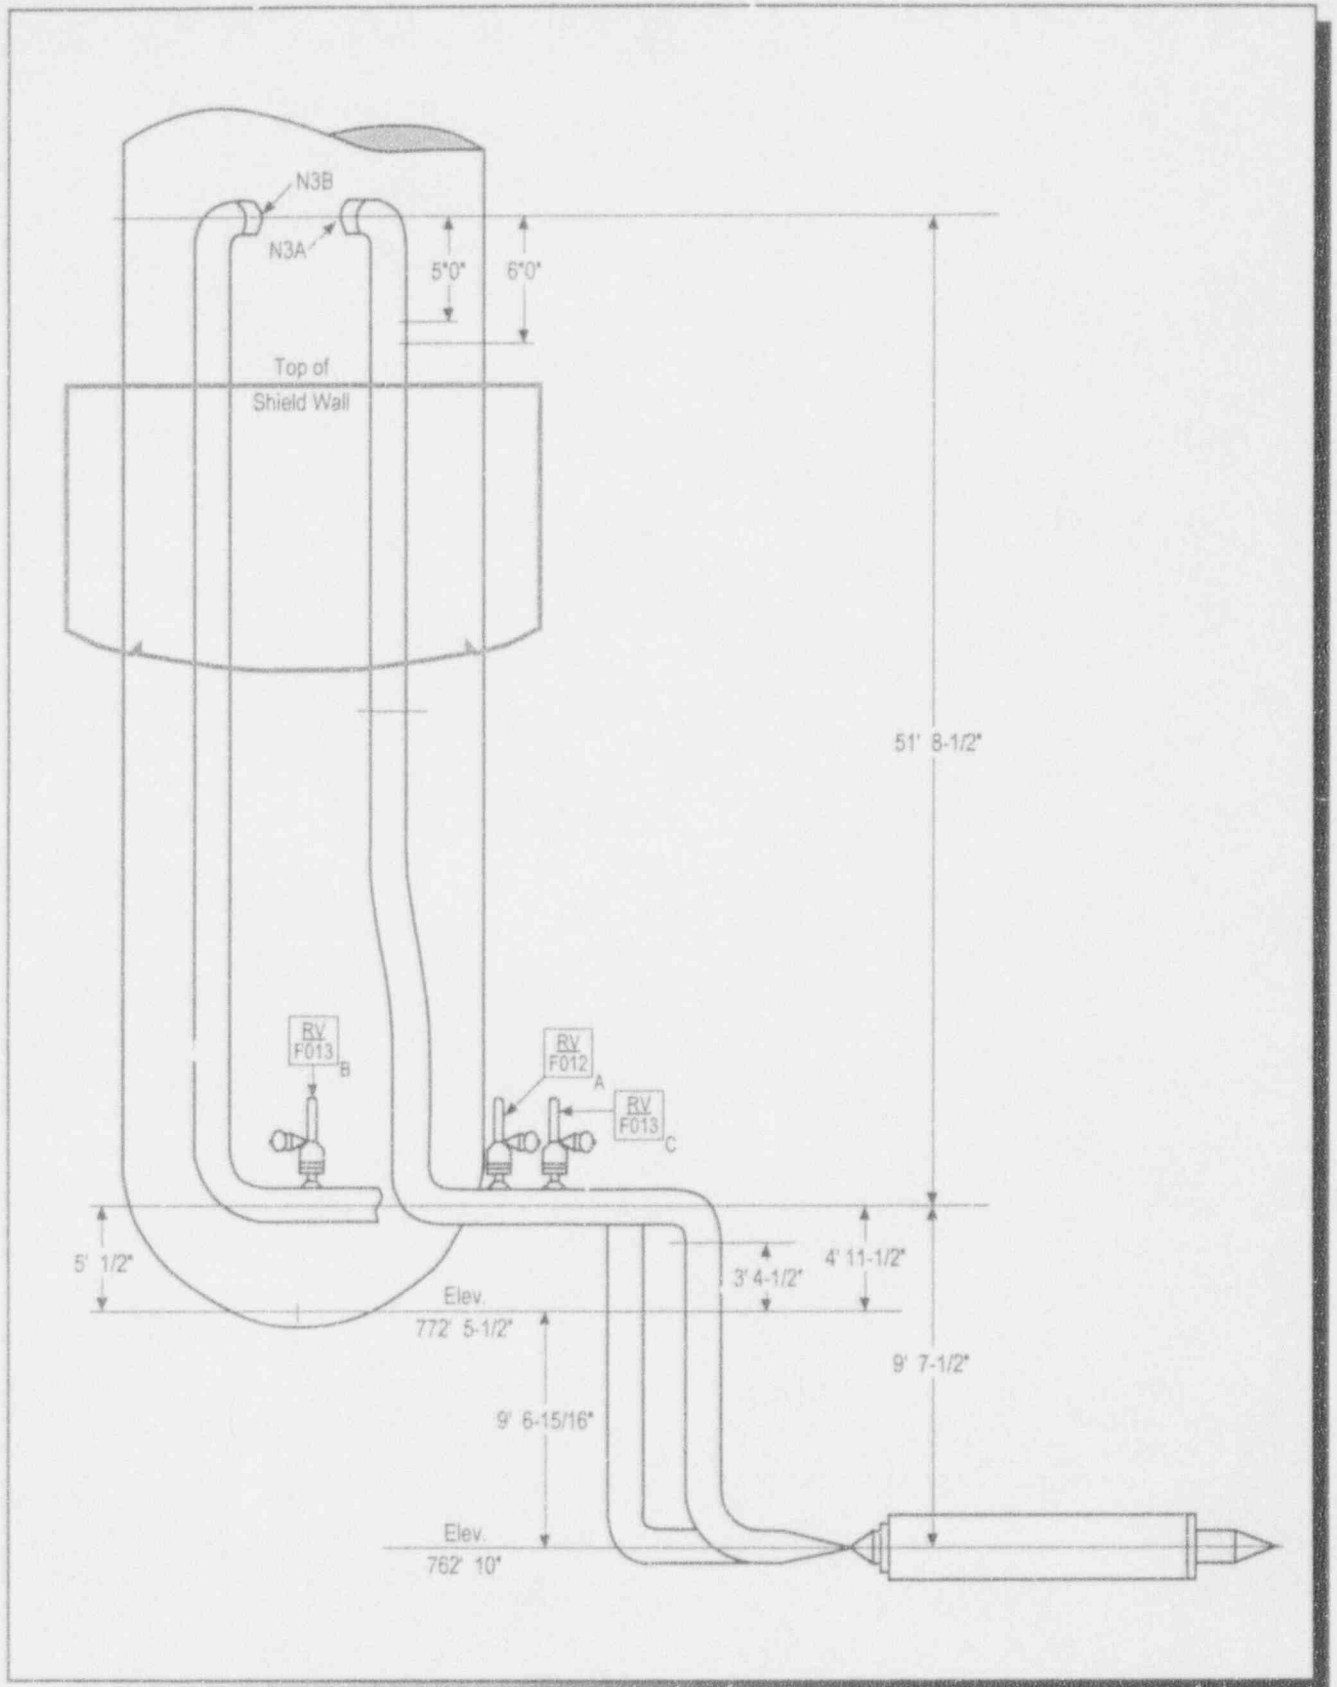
Vertical Cross-Section of Main Steam Line Arrangement in Drywell
